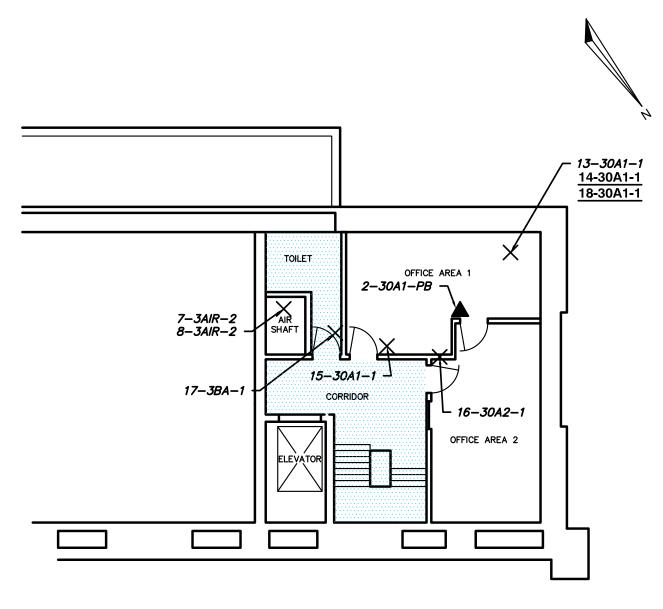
SECOND FLOOR SAMPLING LOCATIONS NORTH PORTION ADMIN. BUILDING CRRA SOUTH MEADOWS STATION GATE 20 RESERVE ROAD HARTFORD, CONNECTICUT HRP # CRR0156.BA SCALE 1" =  $10'\pm$
